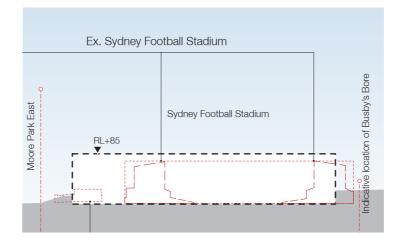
Section East West Looking North Stage 1 DA (Source: SJB)
